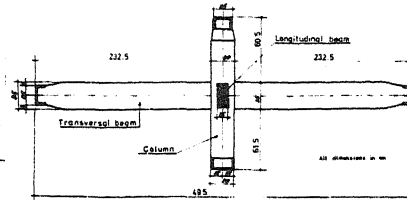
Subassemblage Geometry-Transversal Direction Elevation
